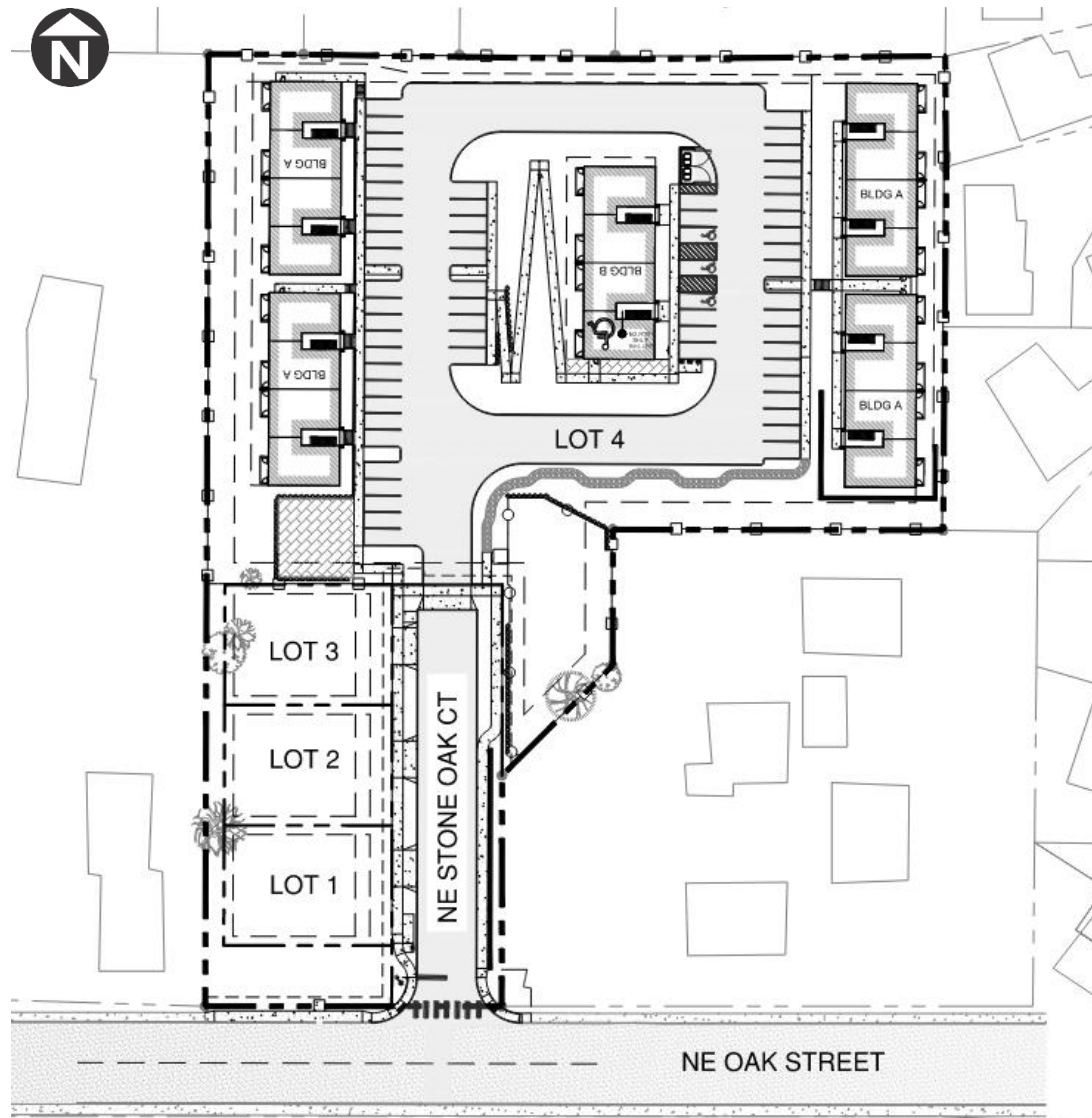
Preliminary Site Plan. Source: BECON Engineering. Dated 9/9/2022
